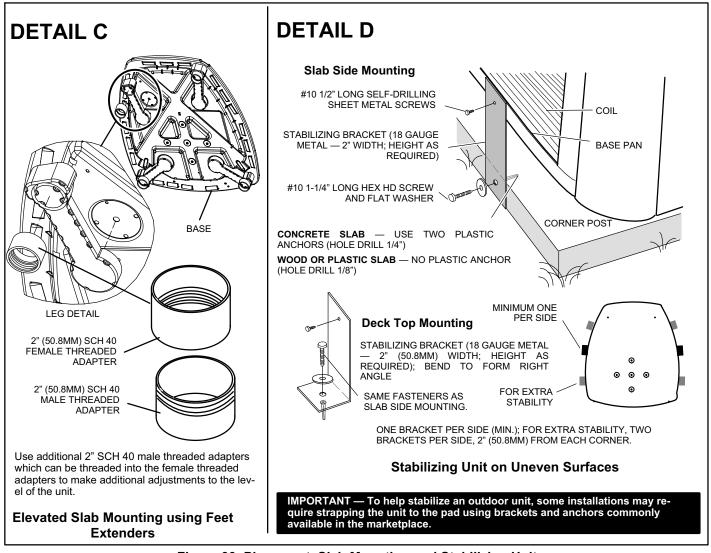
Placement, Slab Mounting and Stabilizing Unit
